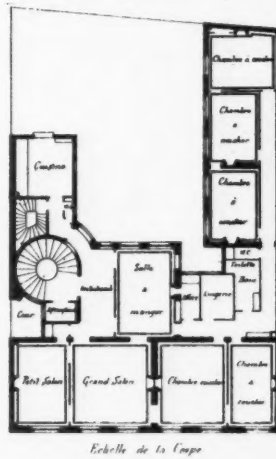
PLAN OF APARTMENT HOUSE IN THE BOULEVARD SAINT-GERMAIN.
